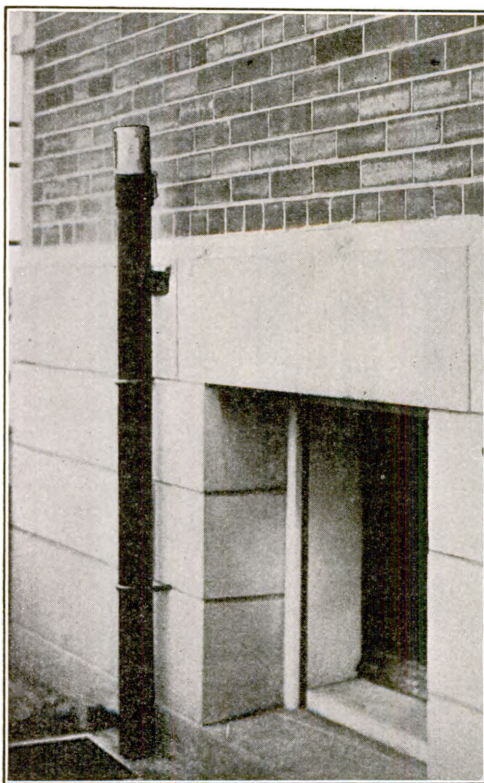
TERMINAL, CAN, UNFUSED, INSTALLED.
